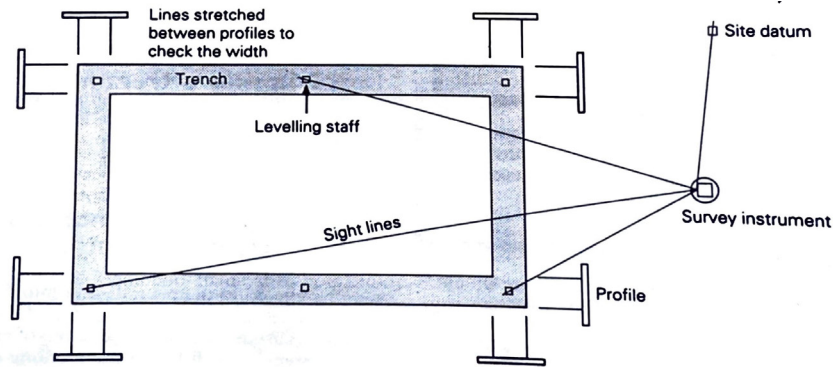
Excavated trench for strip foundation using survey instrument to determine levels for excavation
